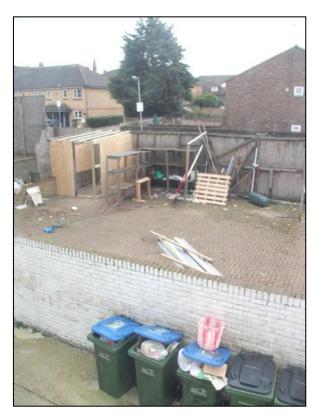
The Proposed Development Site viewed from the stairwell of the flats. Taken from the north - west
